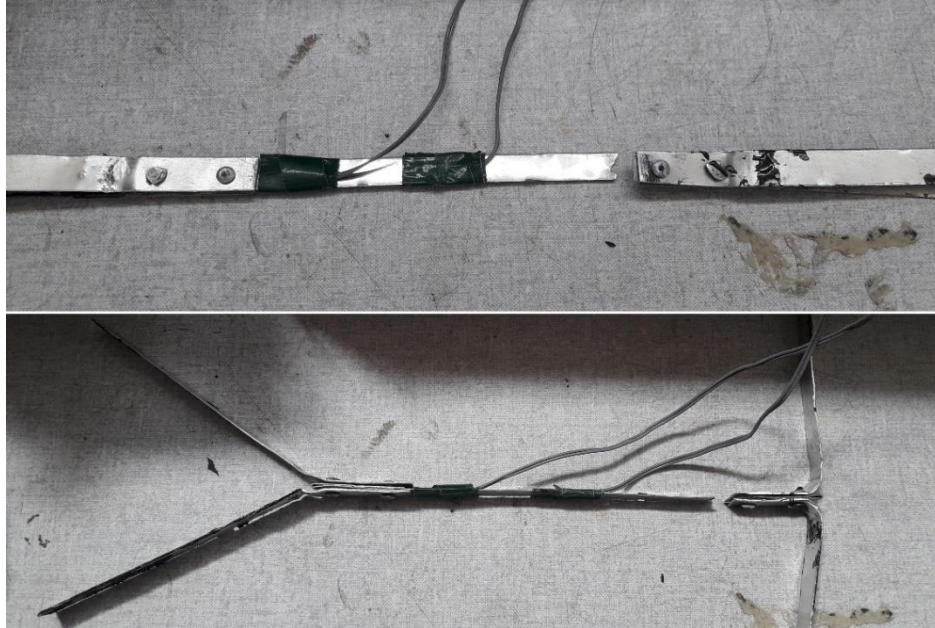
Aluminum Strip at Failure (TRIAL Beam)
